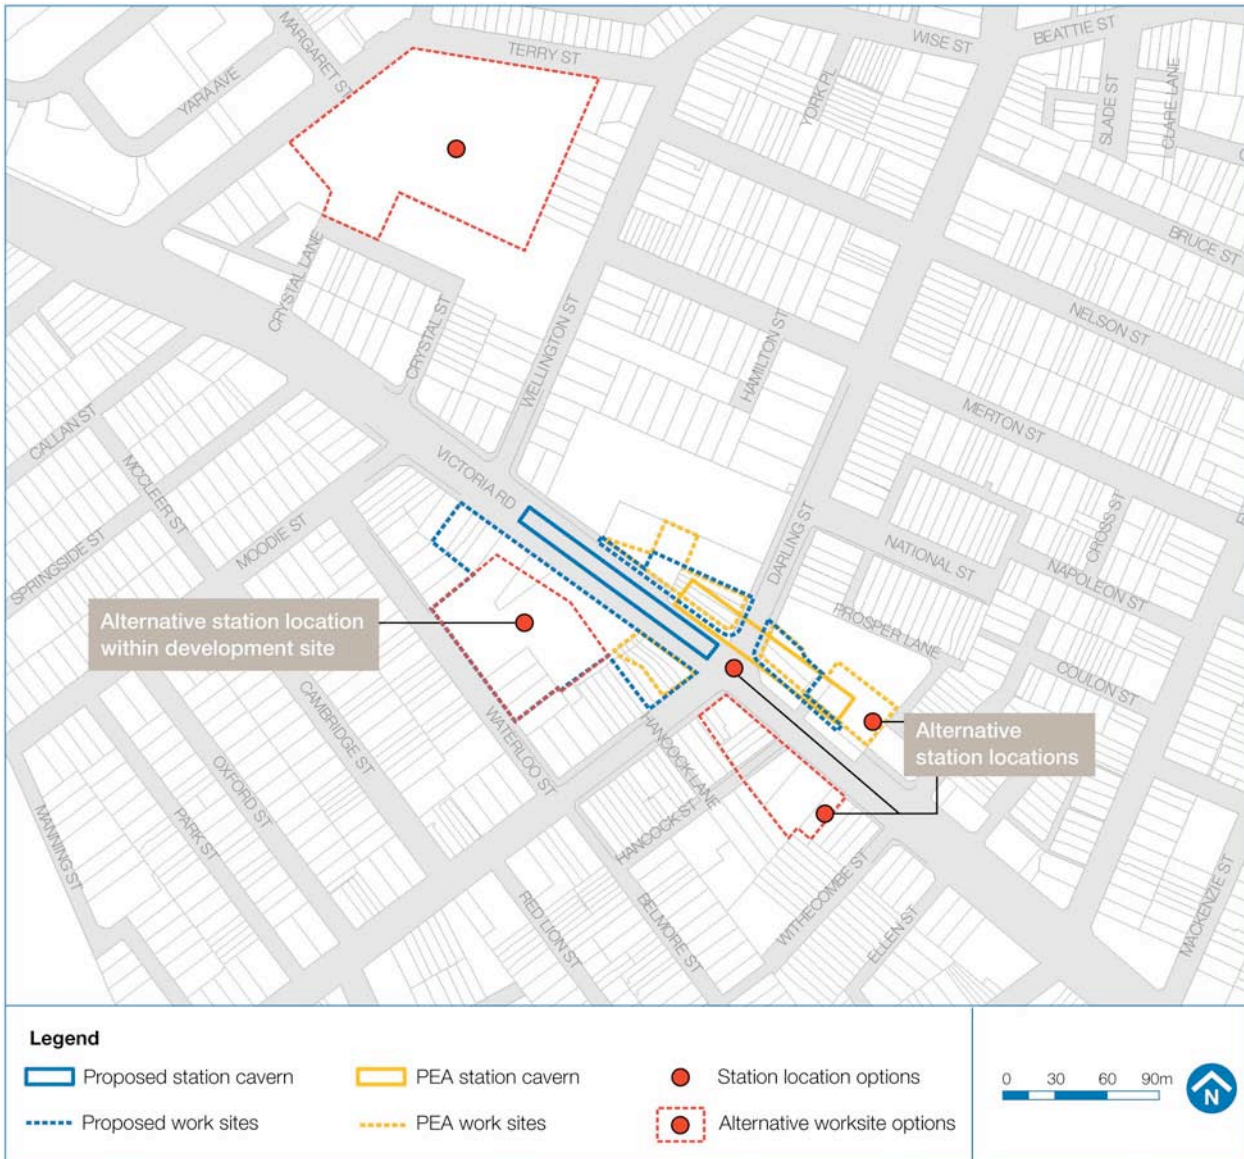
Station location options for Rozelle Station Note: Project detail shown is indicative only, subject to detailed design
